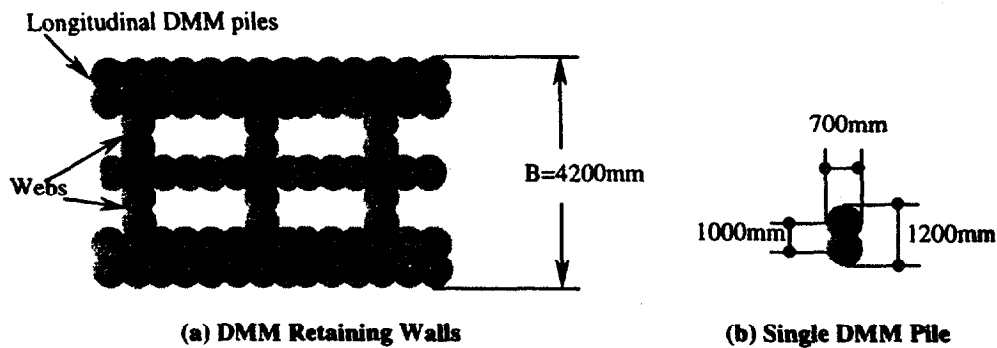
Plan of DMM retaining structure (Shao et al., 1998).
